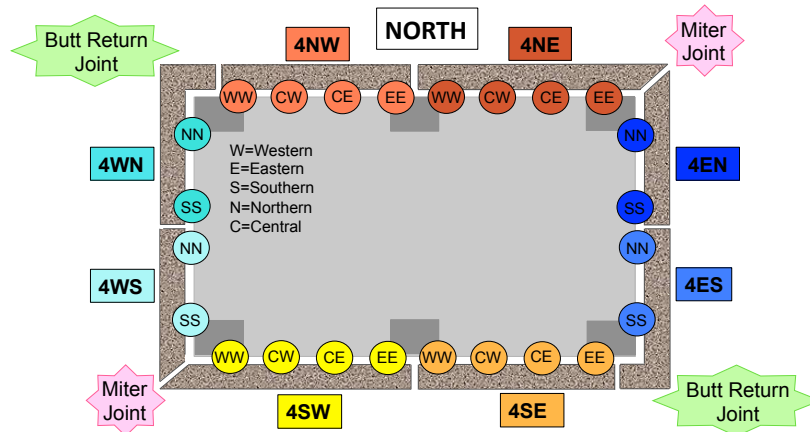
Nomenclature used to identify the panels and connections on the fourth floor. Nomenclature for the fifth floor panels are similar, with the exception that the first digit becomes “5”.
